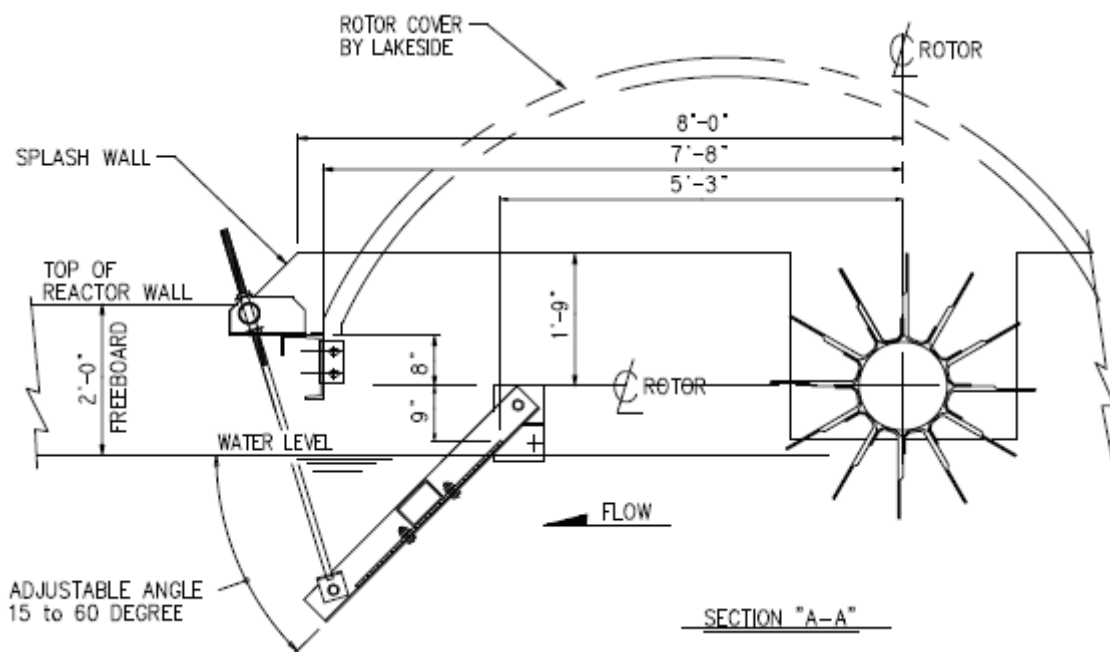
Lakeside Rotor Aerator Assembly Diagram (2)
